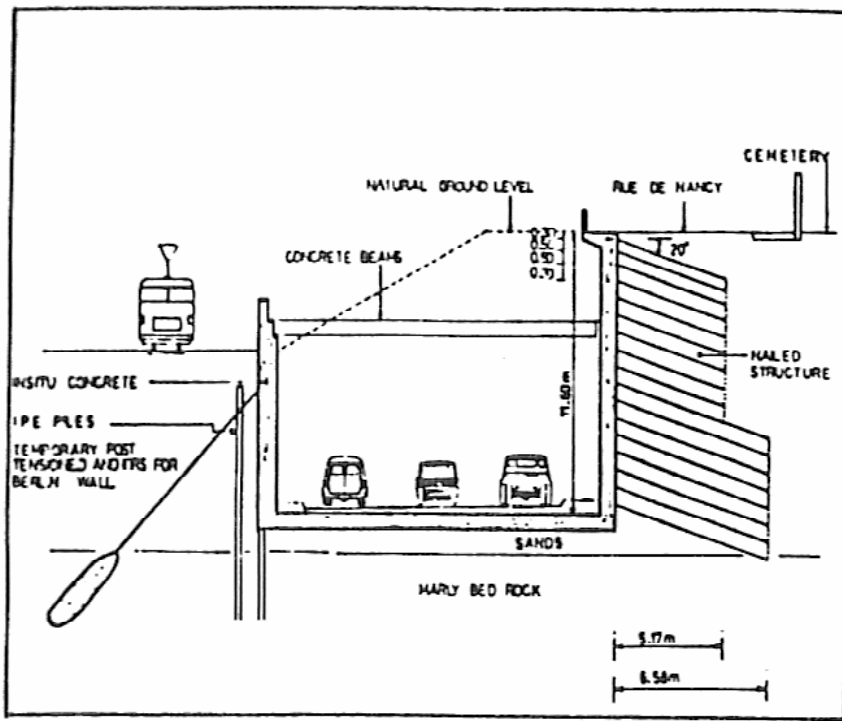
Cross Section of the Nogent-sur-Marne A86 Excavation (after Goulescu and Medio, 1981)
